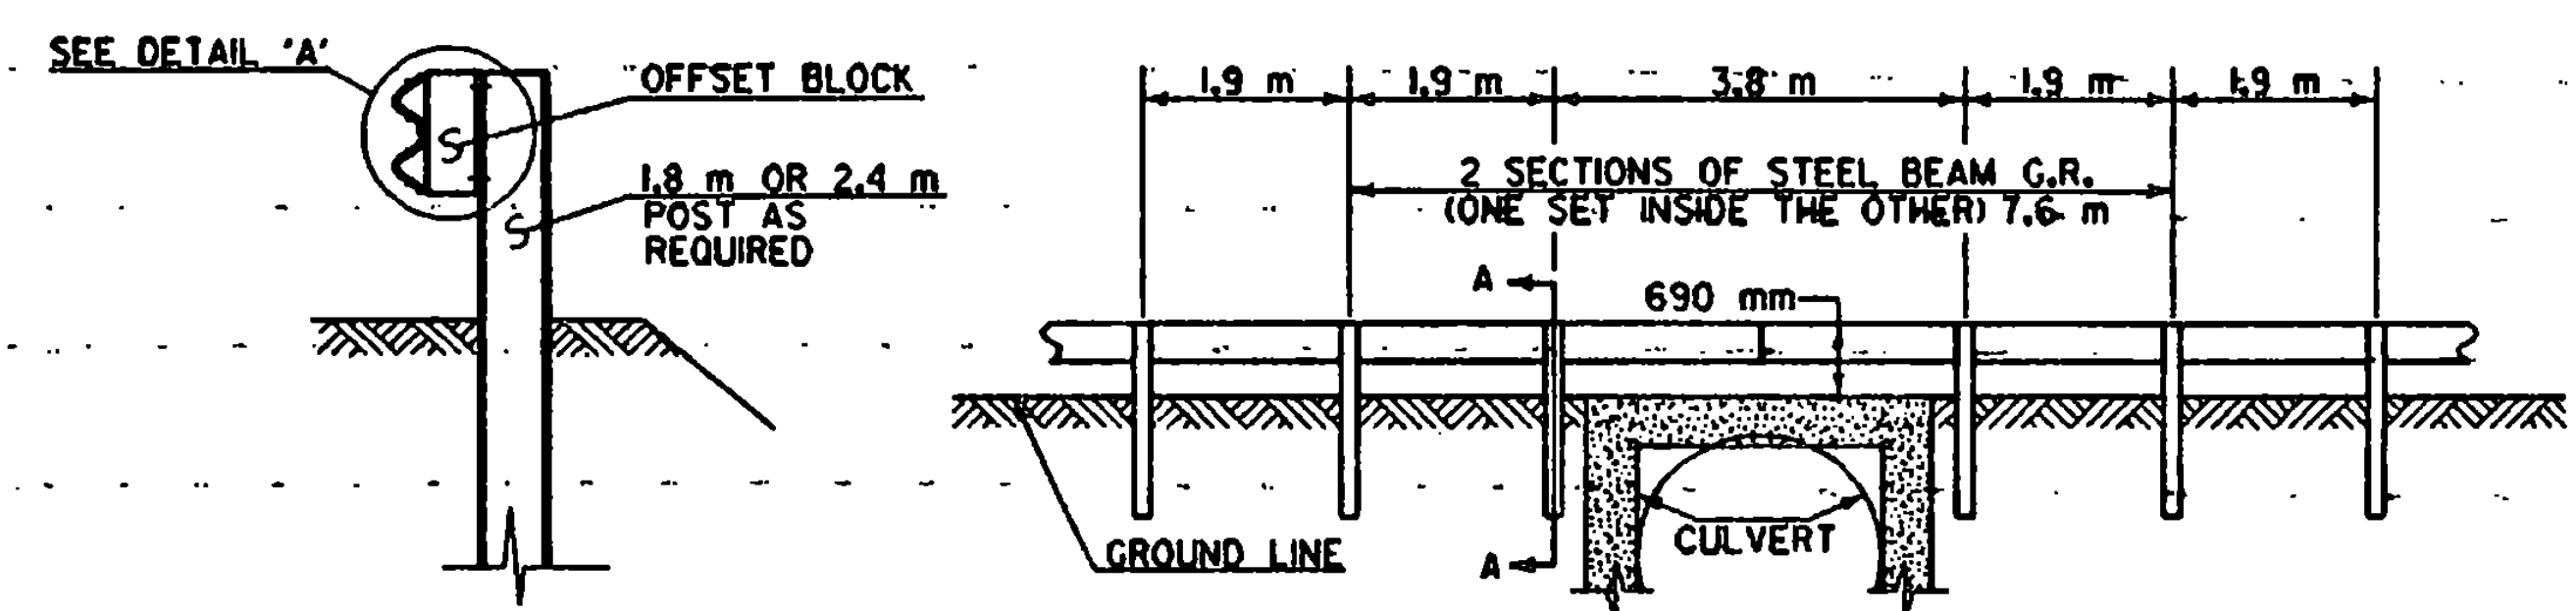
DETAIL OF STEEL BEAM GUARD RAIL AT LARGE CULVERTS
